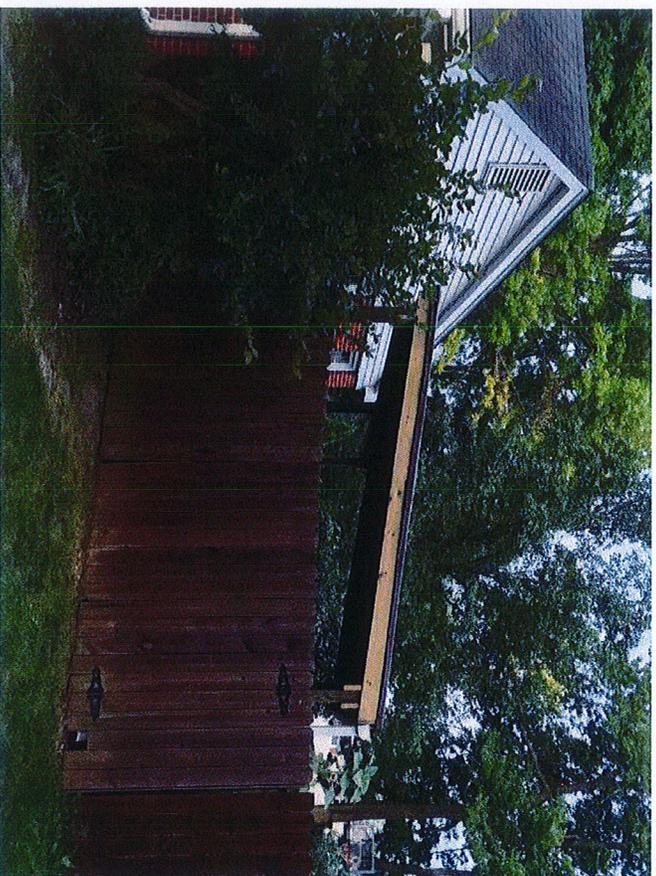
(above left) & 3 (above right): Close-up views show the structure was located to align with the existing gate opening and to maintain the existing landscaping.
